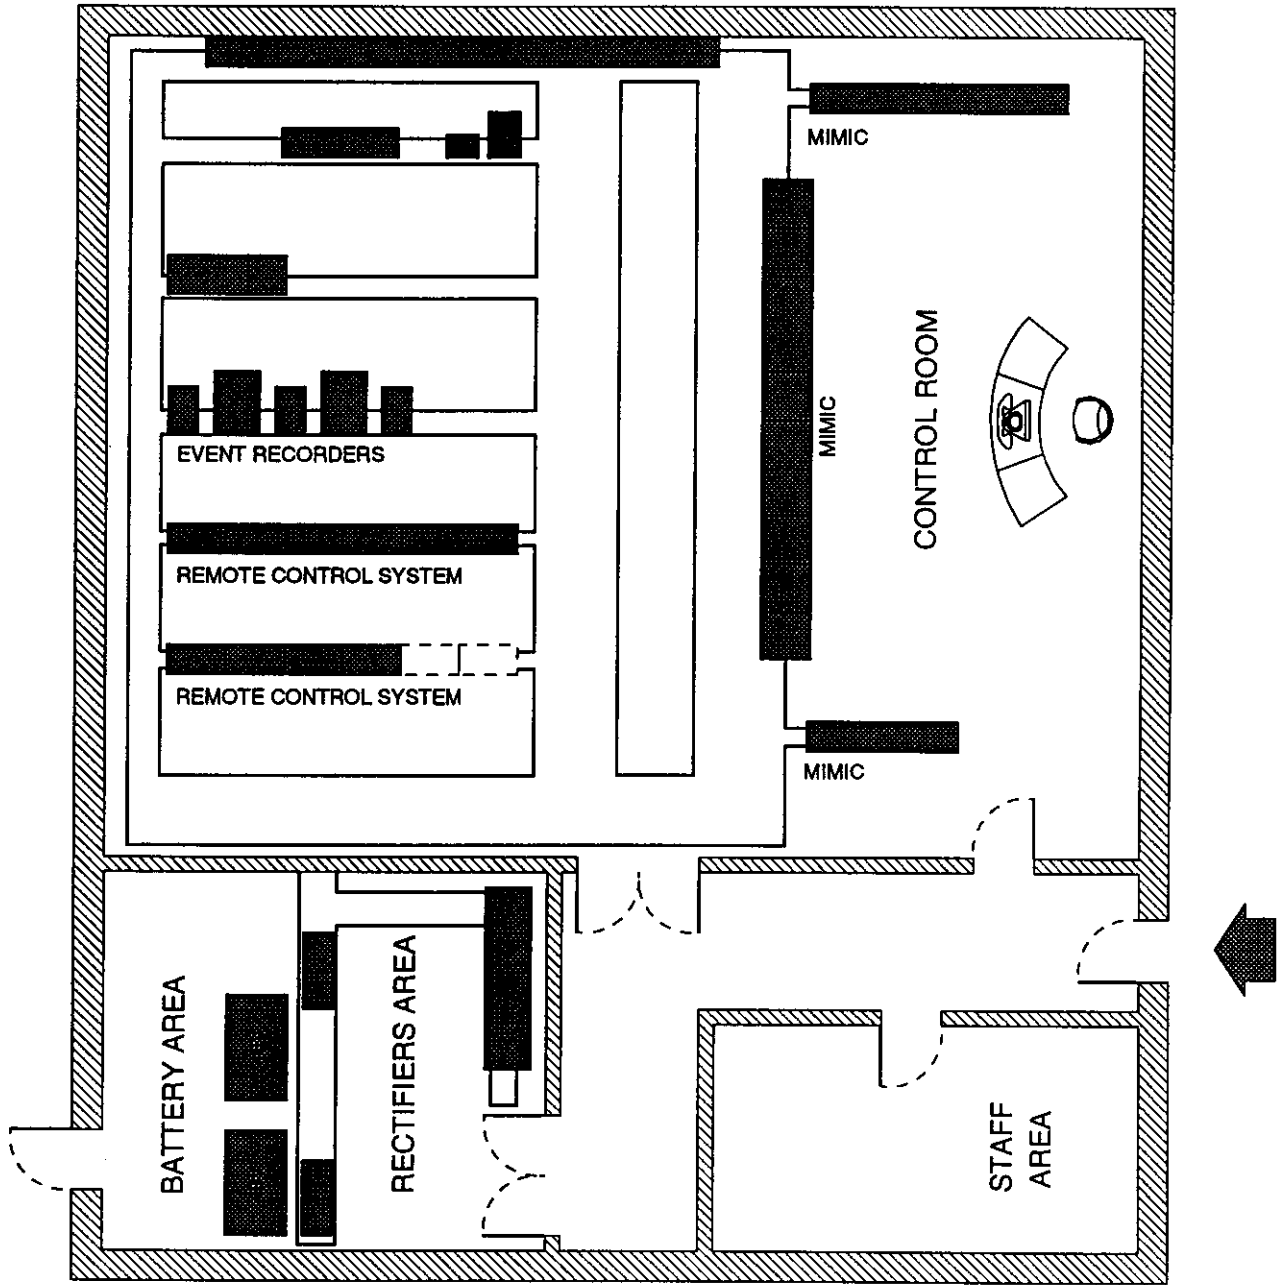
Typical Example of Central Control Building Layout Showing Secondary Equipment Locations
